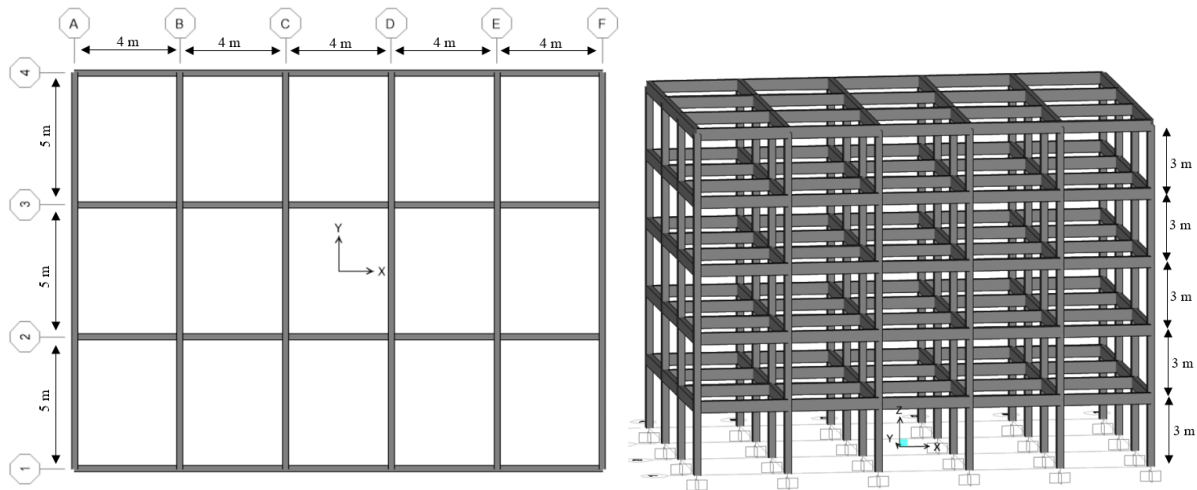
(a) Plan (b) 3D Views of G+4 Storey RC Structure
